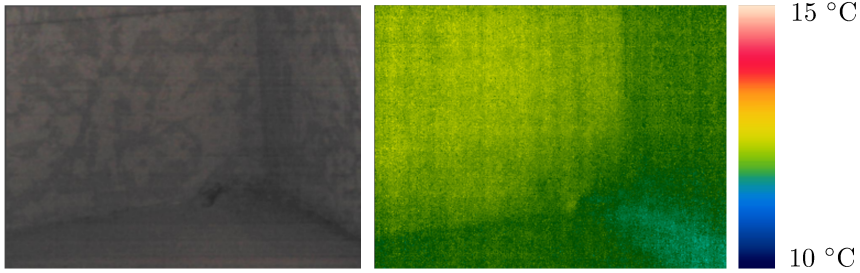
Picture (left) and infrared image (right) of the internal side of the perimeter stone wall of the building of Istituto “Renati” during the renovation. The wall has been structurally reinforced and the foundations have been protected from the ingress of water. The surface has a uniform colour (picture on the right) and thus, a uniform temperature and there are not signs of rising damp.
